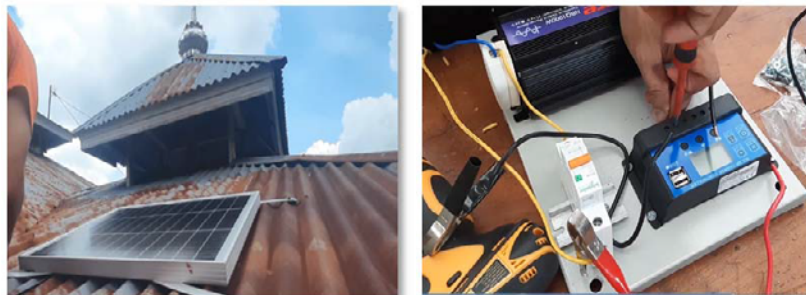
Rooftop panel installation, wiring connections, and inverter setup
